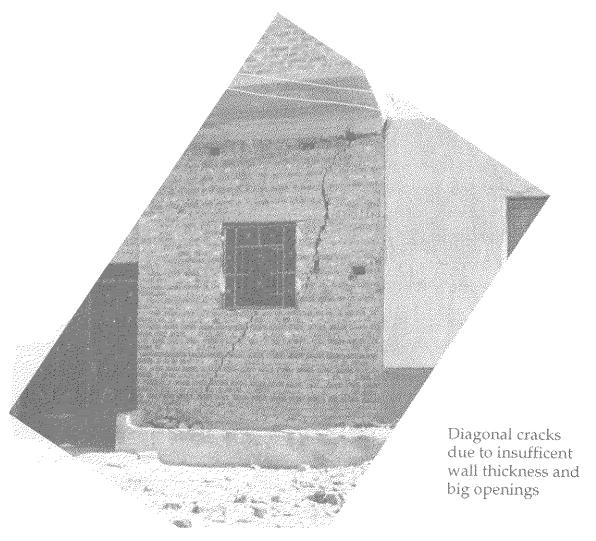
Damage to unreinforced masonry buildings.
